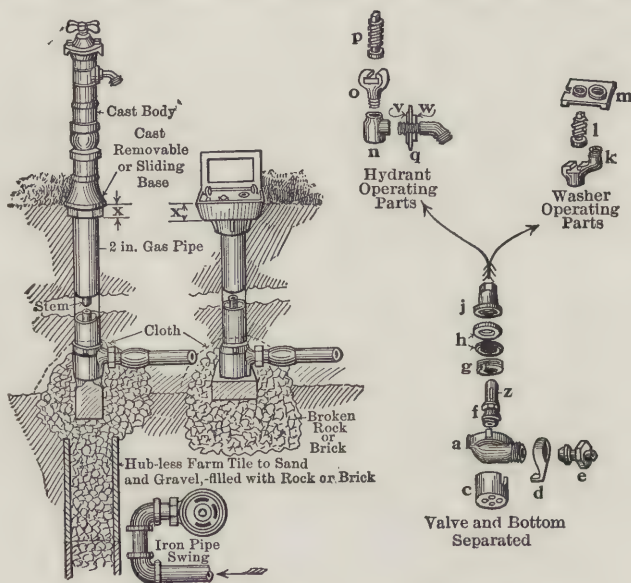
STREET WASHER AND YARD HYDRANT WORK
